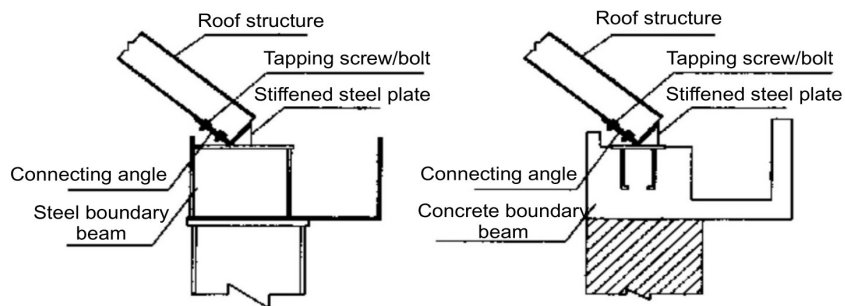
Hinge-like connection method between K-Span arches and base [23]
